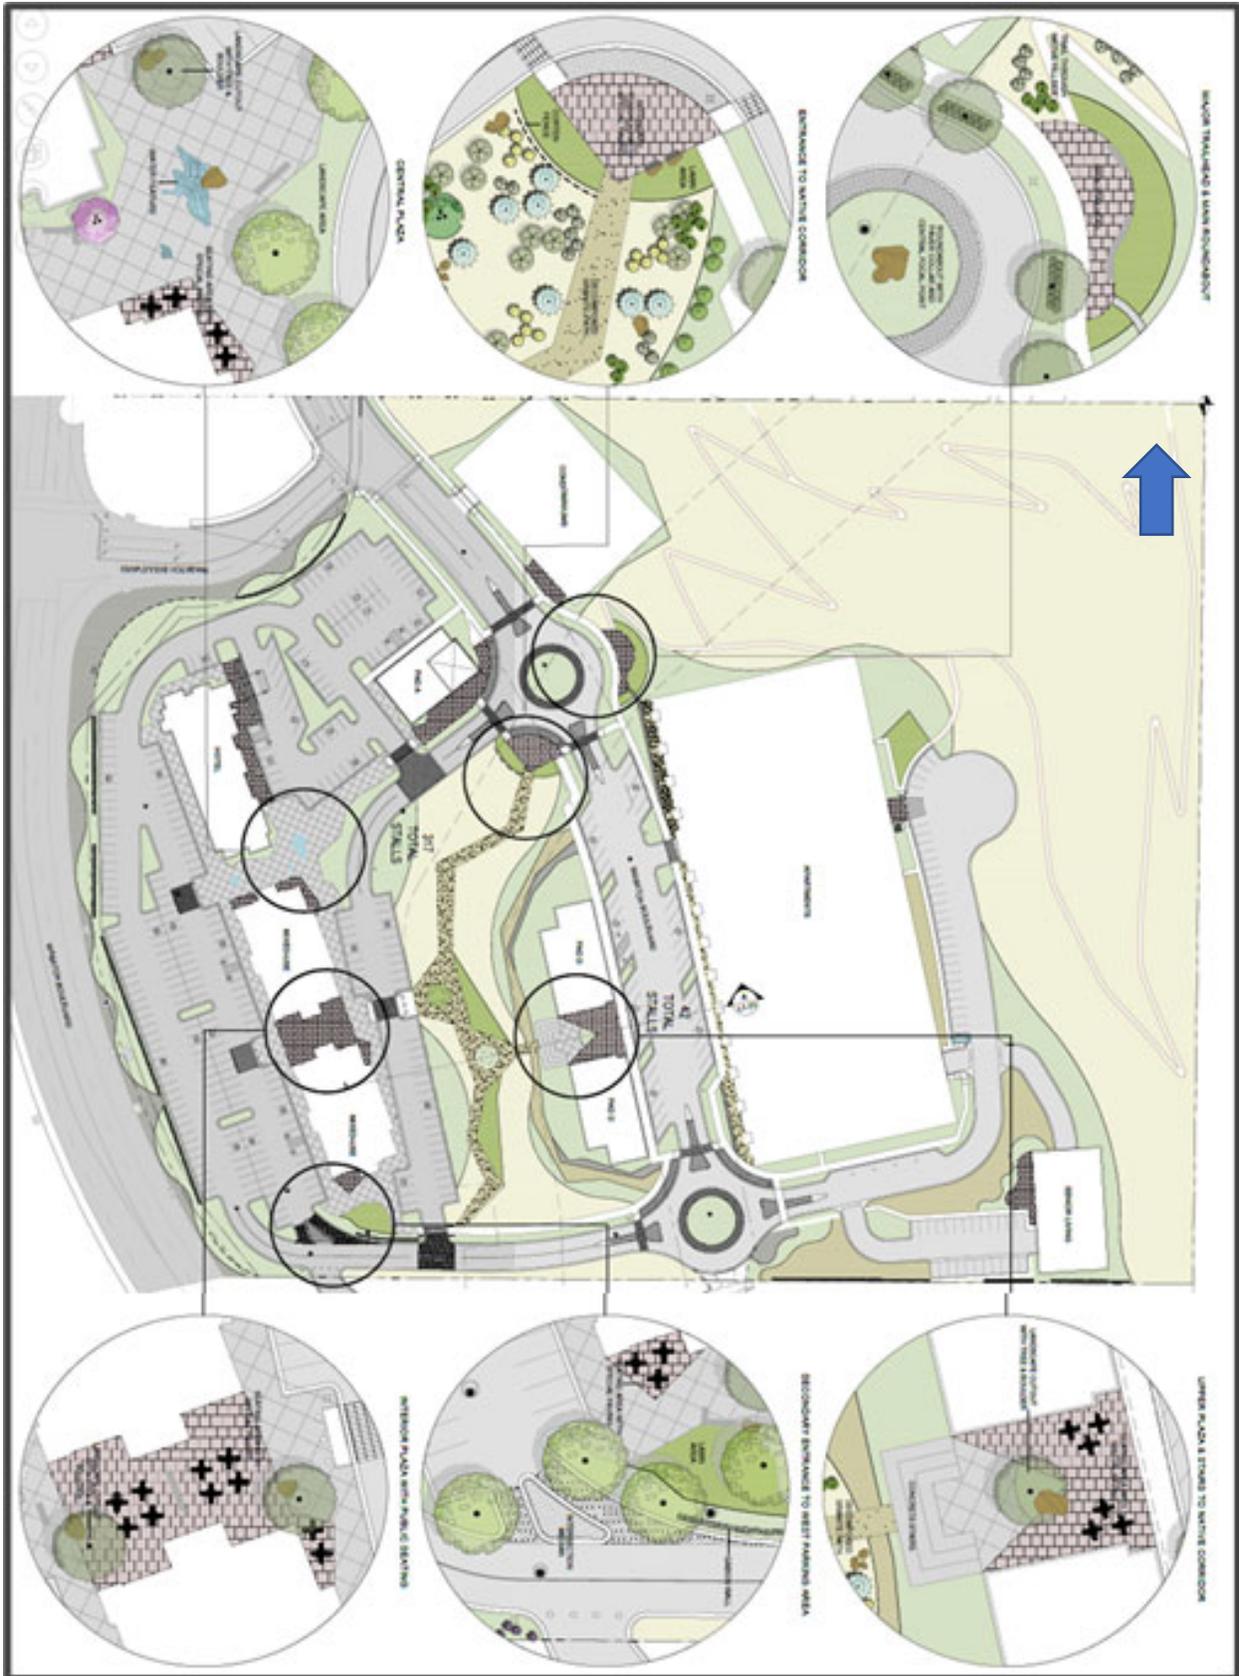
LANDSCAPING DETAIL - BUILDING SITE PLAN OUTDATED.
